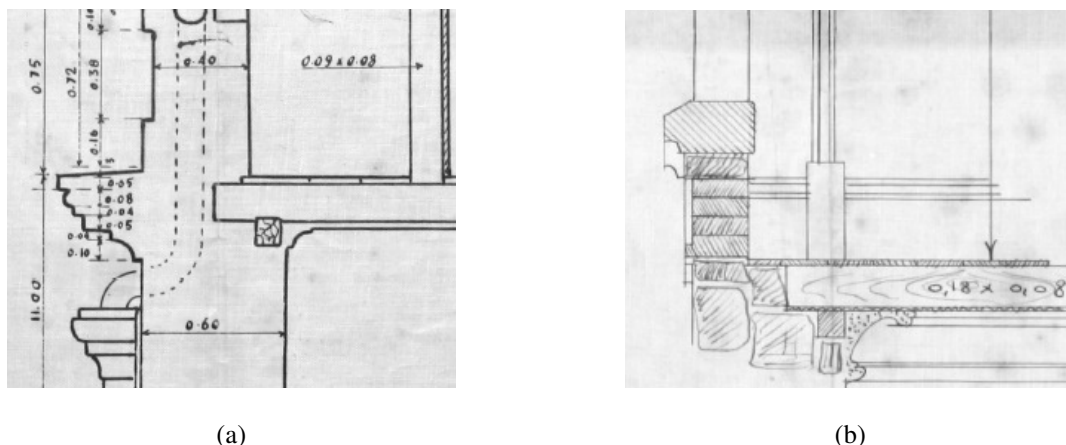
Detail of a wall-to-floor connection: (a) ‘Gaioleiro’ building; (b) Late ‘Pombalino’
